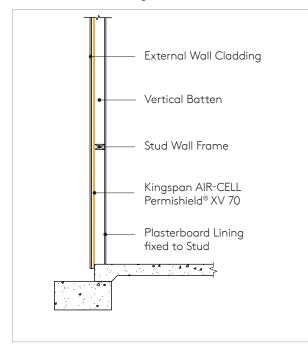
Side elevation of Kingspan AIR-CELL Permishield $^{\otimes}$ XV 70 in a timber-framed wall.
